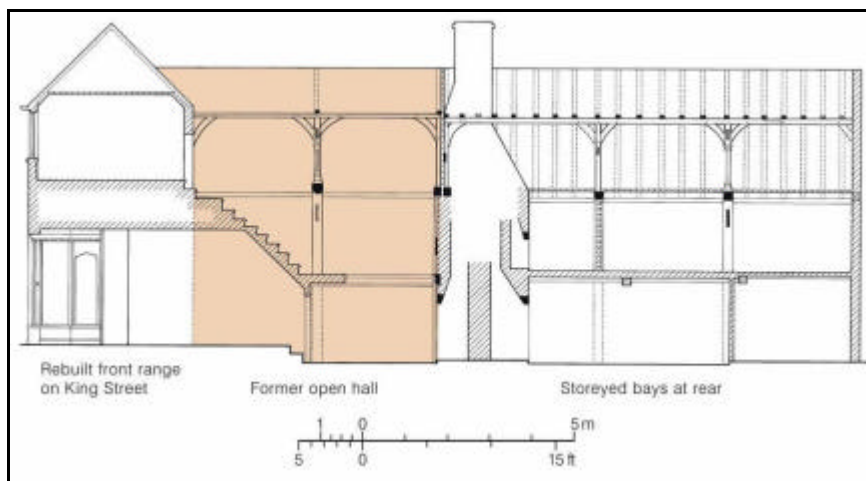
Long section of 38 King Street (Allan T. Adams)
